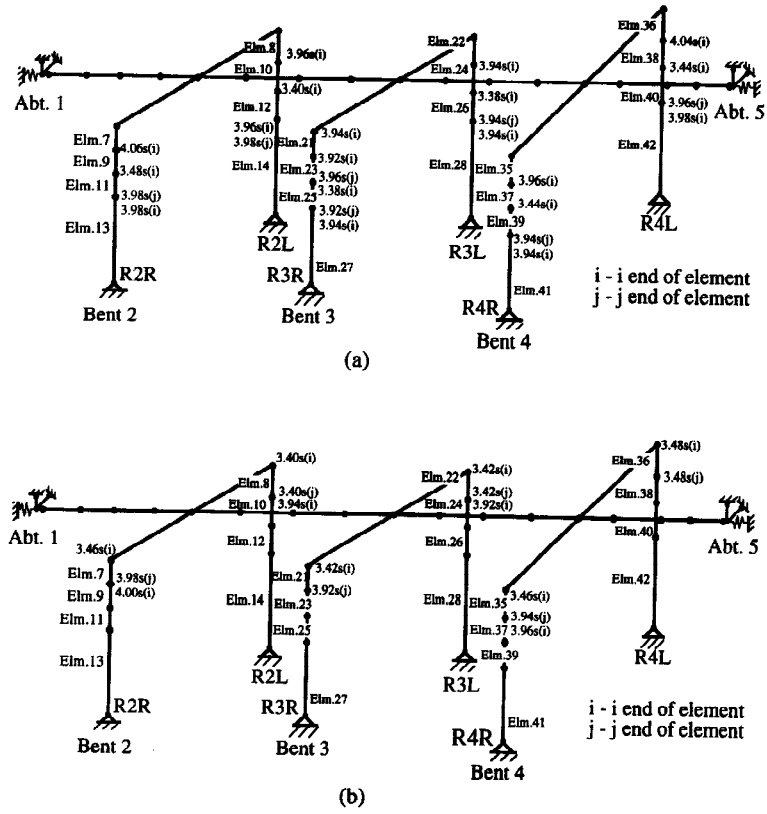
Yielding patterns: (a) column with flare; (b) column without flare
